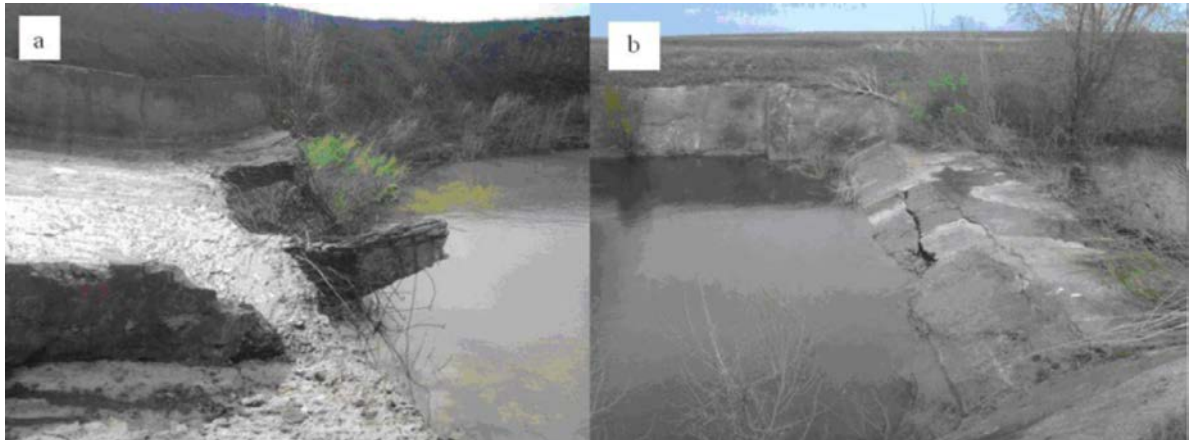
A view of the structure: (a) the cantilever spillover; (b) overflow dam
